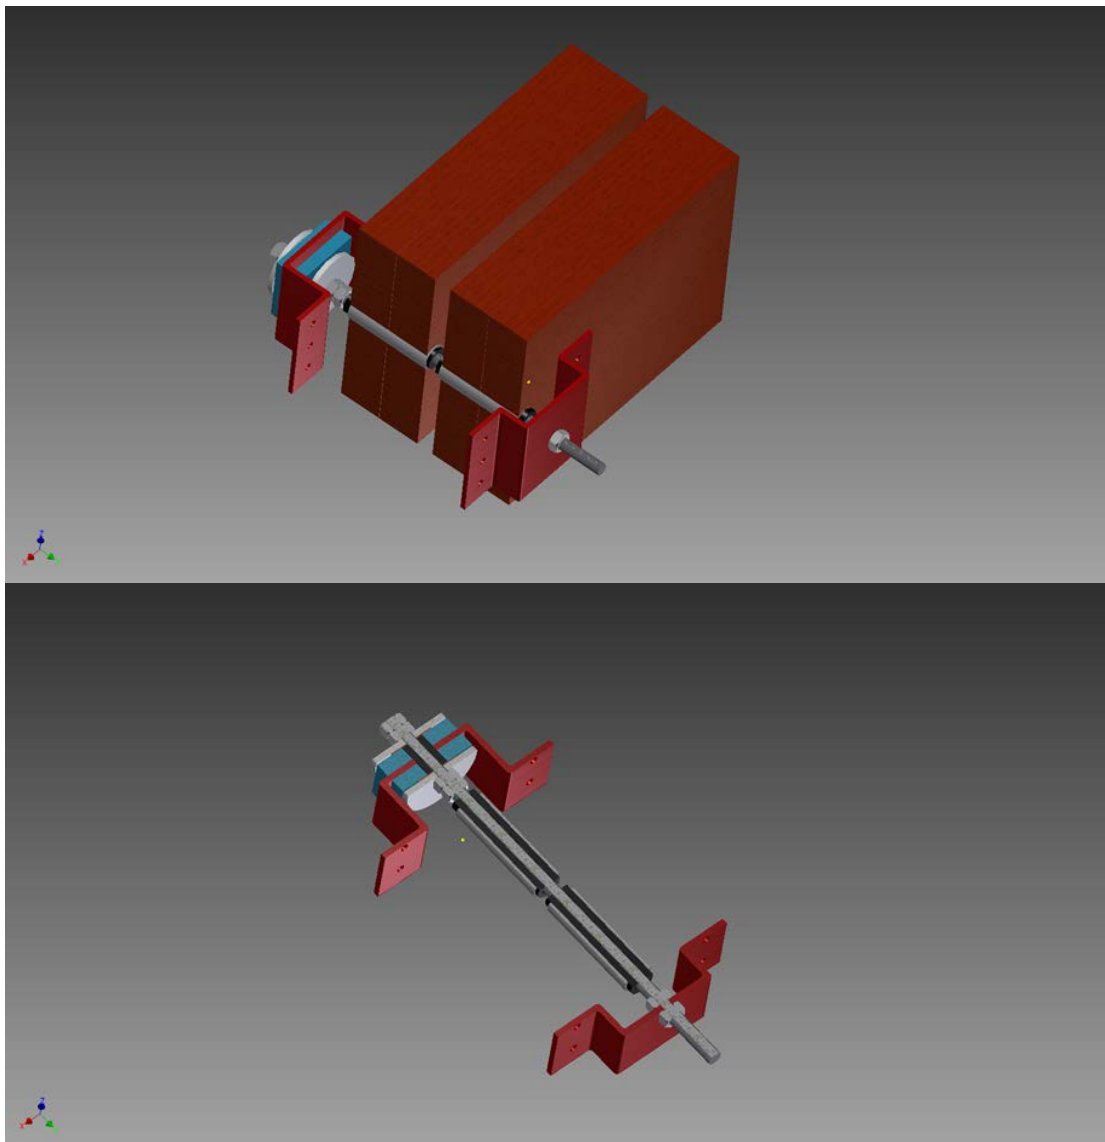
Through-joist connector design (Option 1), full with joists shown (above), and in cross section (below)
